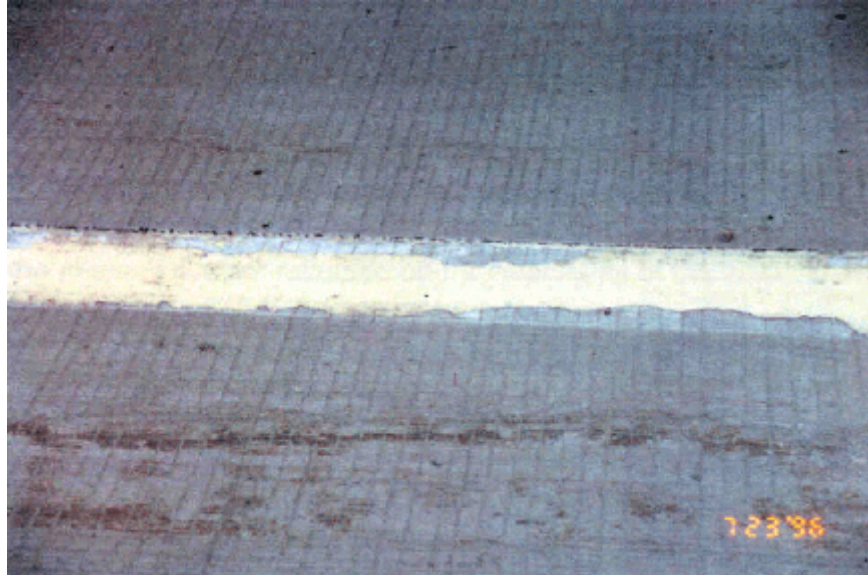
Damaged areas encountered on the northbound on-ramp from I-94 to I-29.
